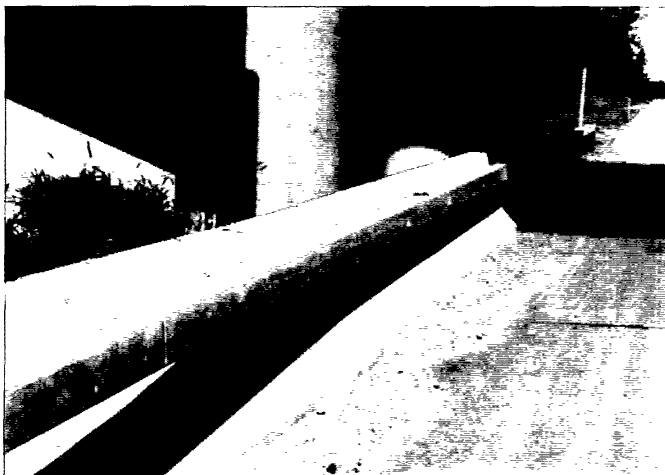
Concrete Barrier Modification to Limit Roll Angle
